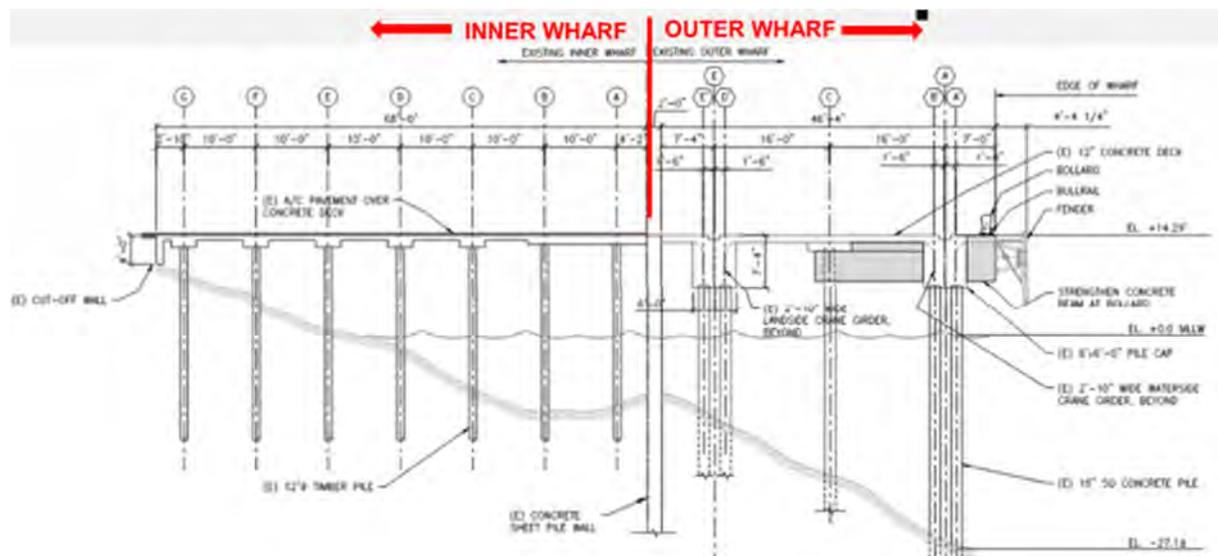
Berths 7 and 8 Wharf Cross Section, water to the right, fender and bollard strengthening beams in gray
